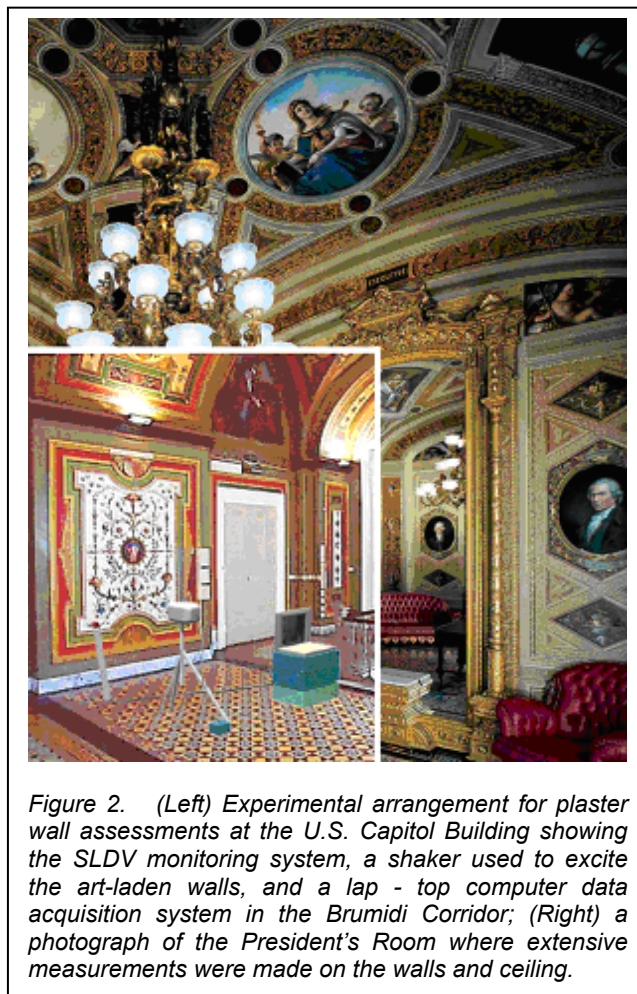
(Left) Experimental arrangement for plaster wall assessments at the U.S. Capitol Building showing the SLDV monitoring system, a shaker used to excite the art-laden walls, and a lap - top computer data acquisition system in the Brumidi Corridor; (Right) a photograph of the President's Room where extensive measurements were made on the walls and ceiling.
